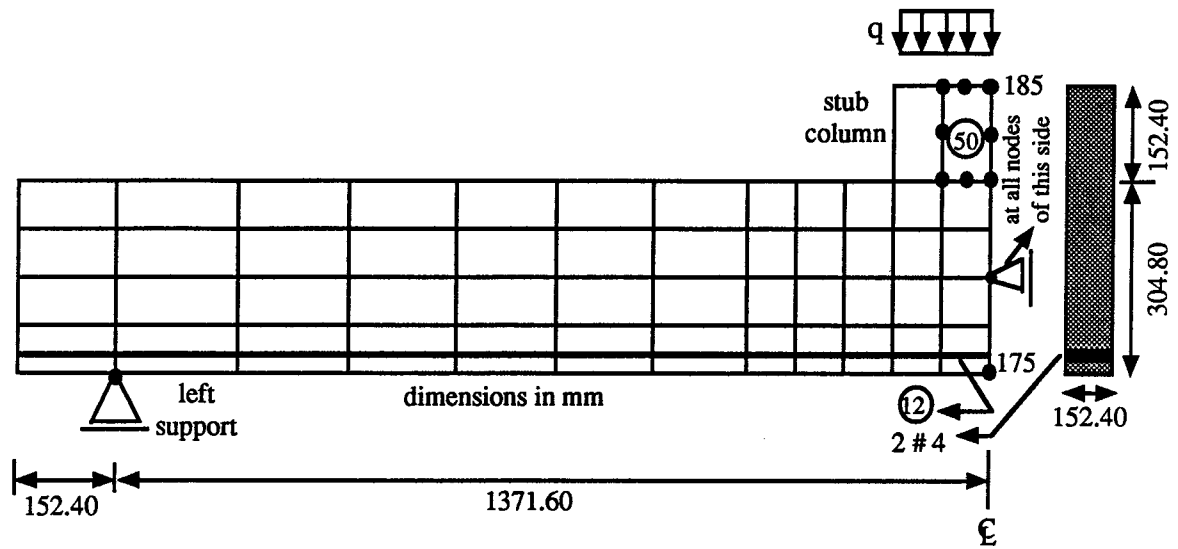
Discretization, dimensions, loads and boundary conditions for the reinforced concrete shallow beam.
